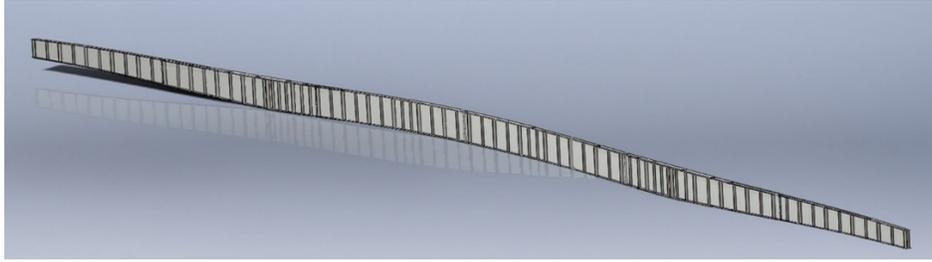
One Girder Line Containing Six Girder Segments Fabricated Using the BRIDGE VAS
